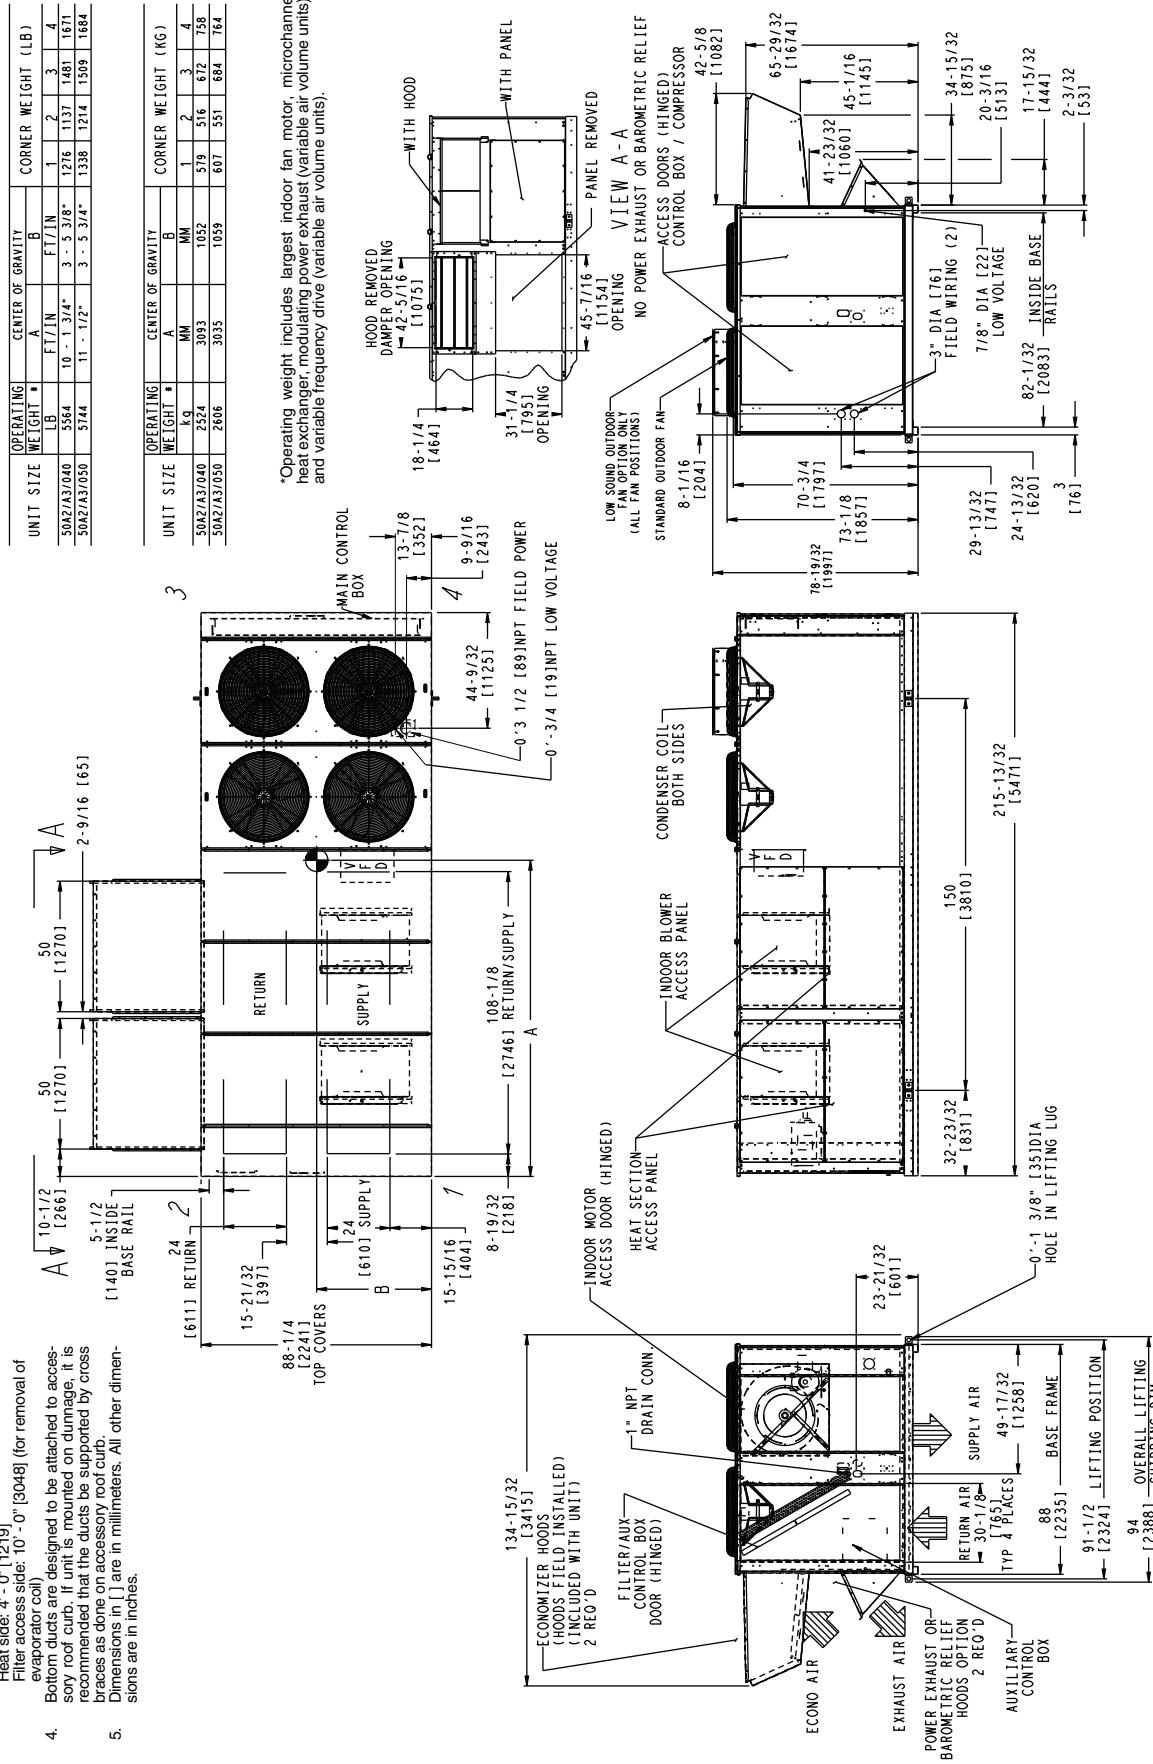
Base Unit Dimensions — 50A2,A3040-050
